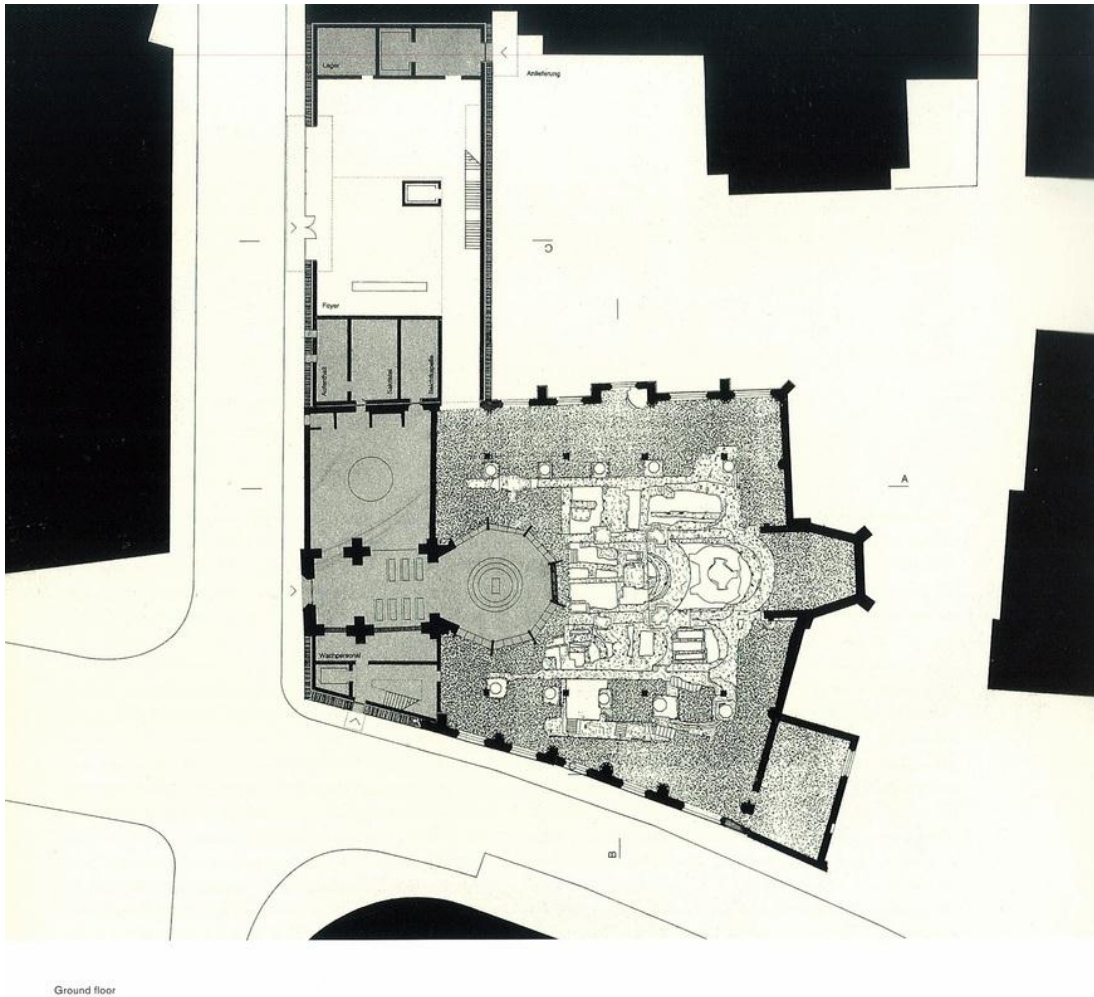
Ground floor plan. (Drawing: [Internet, WWW] Address: https://shakespeareintitchfield.weebly.com/uploads/1/5/3/9/15391744/1909771_orig.jpg)
